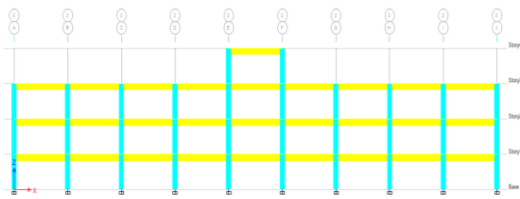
Symmetric 15 Bedded Hospital Building Elevation at one specific grid
